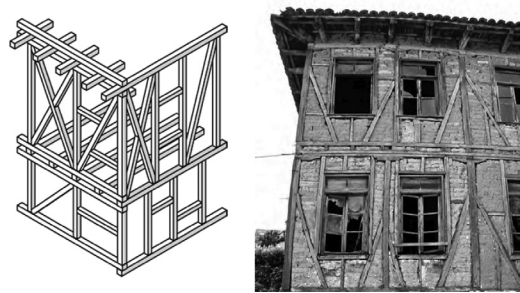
Timber frame System. The building system scheme; example of a building in Kastaneri, Greece. Drawing: D. Omar Sidik. Photo: S. Mecca.
